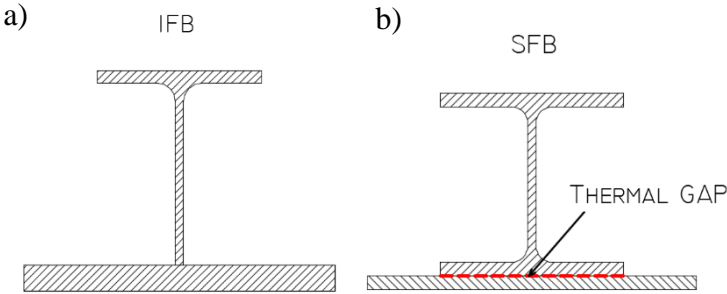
Types of slim-floor beams: a) IFB, b) SFB.
